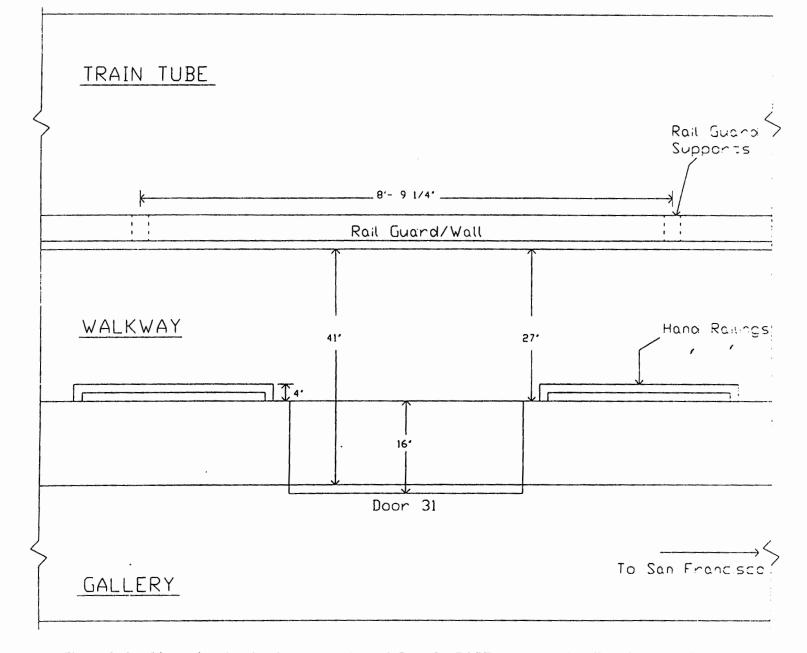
Dimension drawing for access through Door 31, BART transbay tube. Front view from gallery, through door into train tube.
